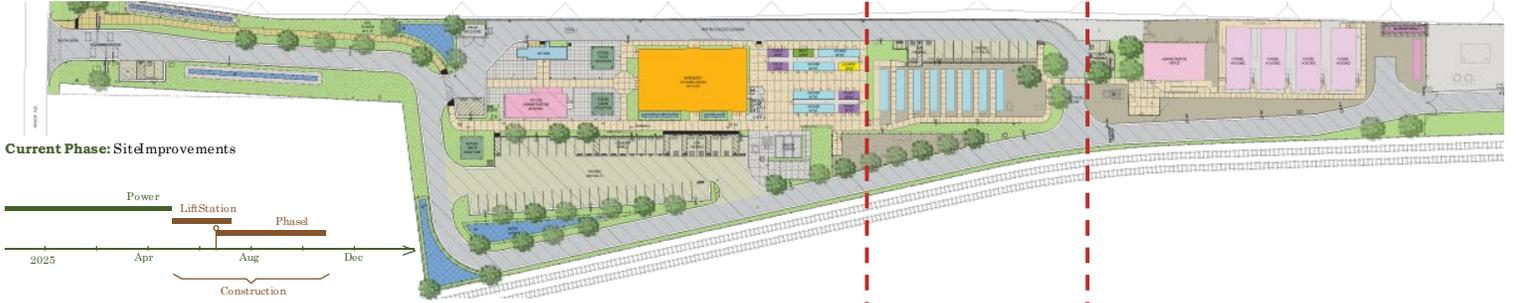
# EXHIBIT C – TEMPORARY EMERGENCY HOUSING FACILITY SITE PLAN
